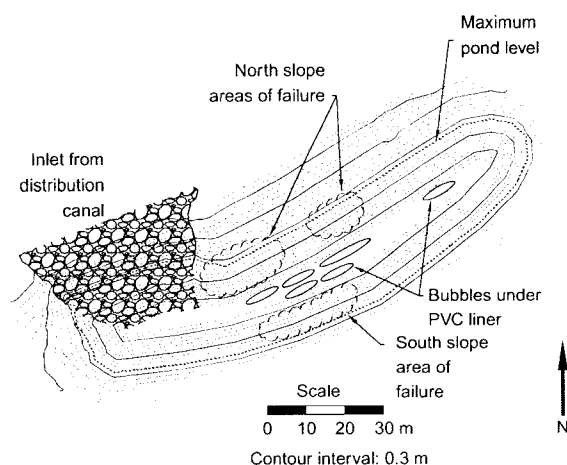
Plan view showing location of failures and bubbles under the geomembrane
